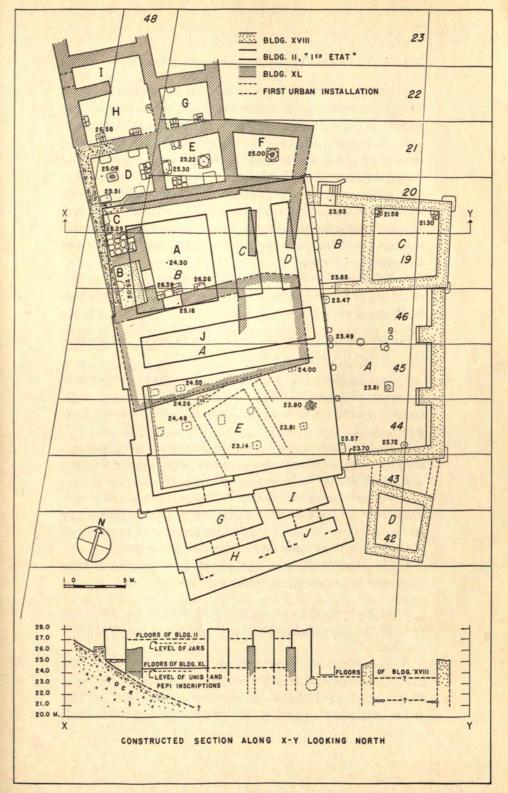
Plans of the Byblos Buildings Assembled and Superimposed, and a Constructed Section
